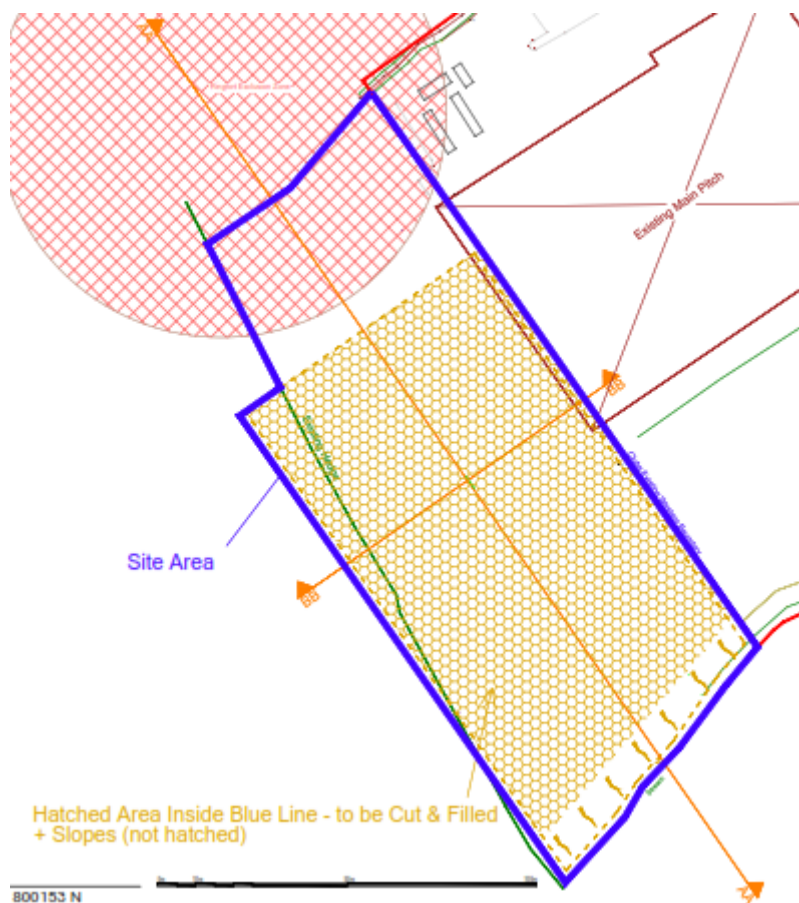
Revised extent of land proposed to be developed as new training pitch for Carrick-on-Shannon Rugby Club
